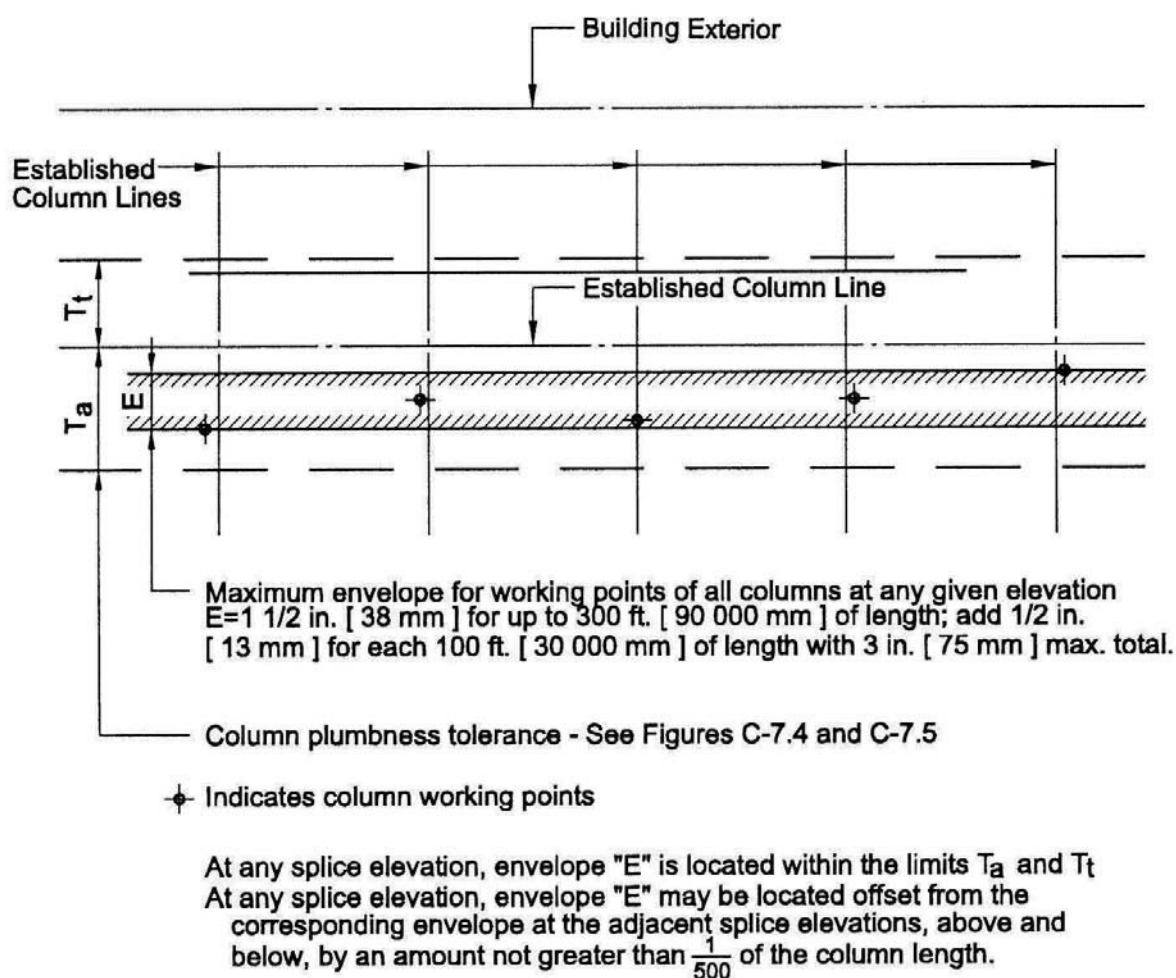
Tolerances in plan at any splice elevation of exterior columns.
